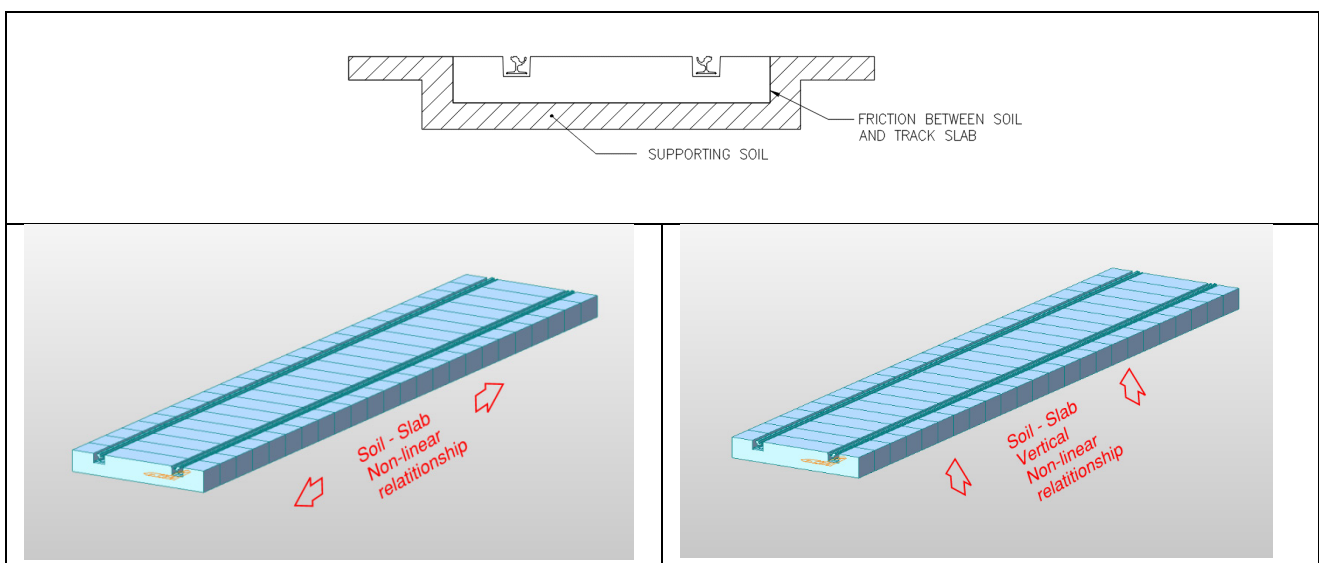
Cross section and non-linear longitudinal springs used between the soil and slab
